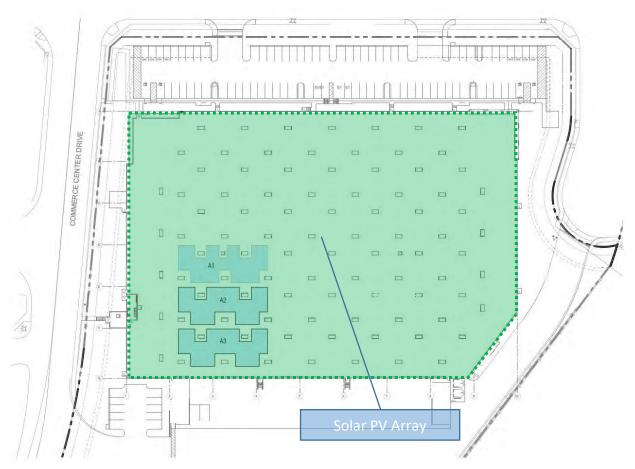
Majestic Freeway Business Center – Building 12 Project – Solar PV Installation
